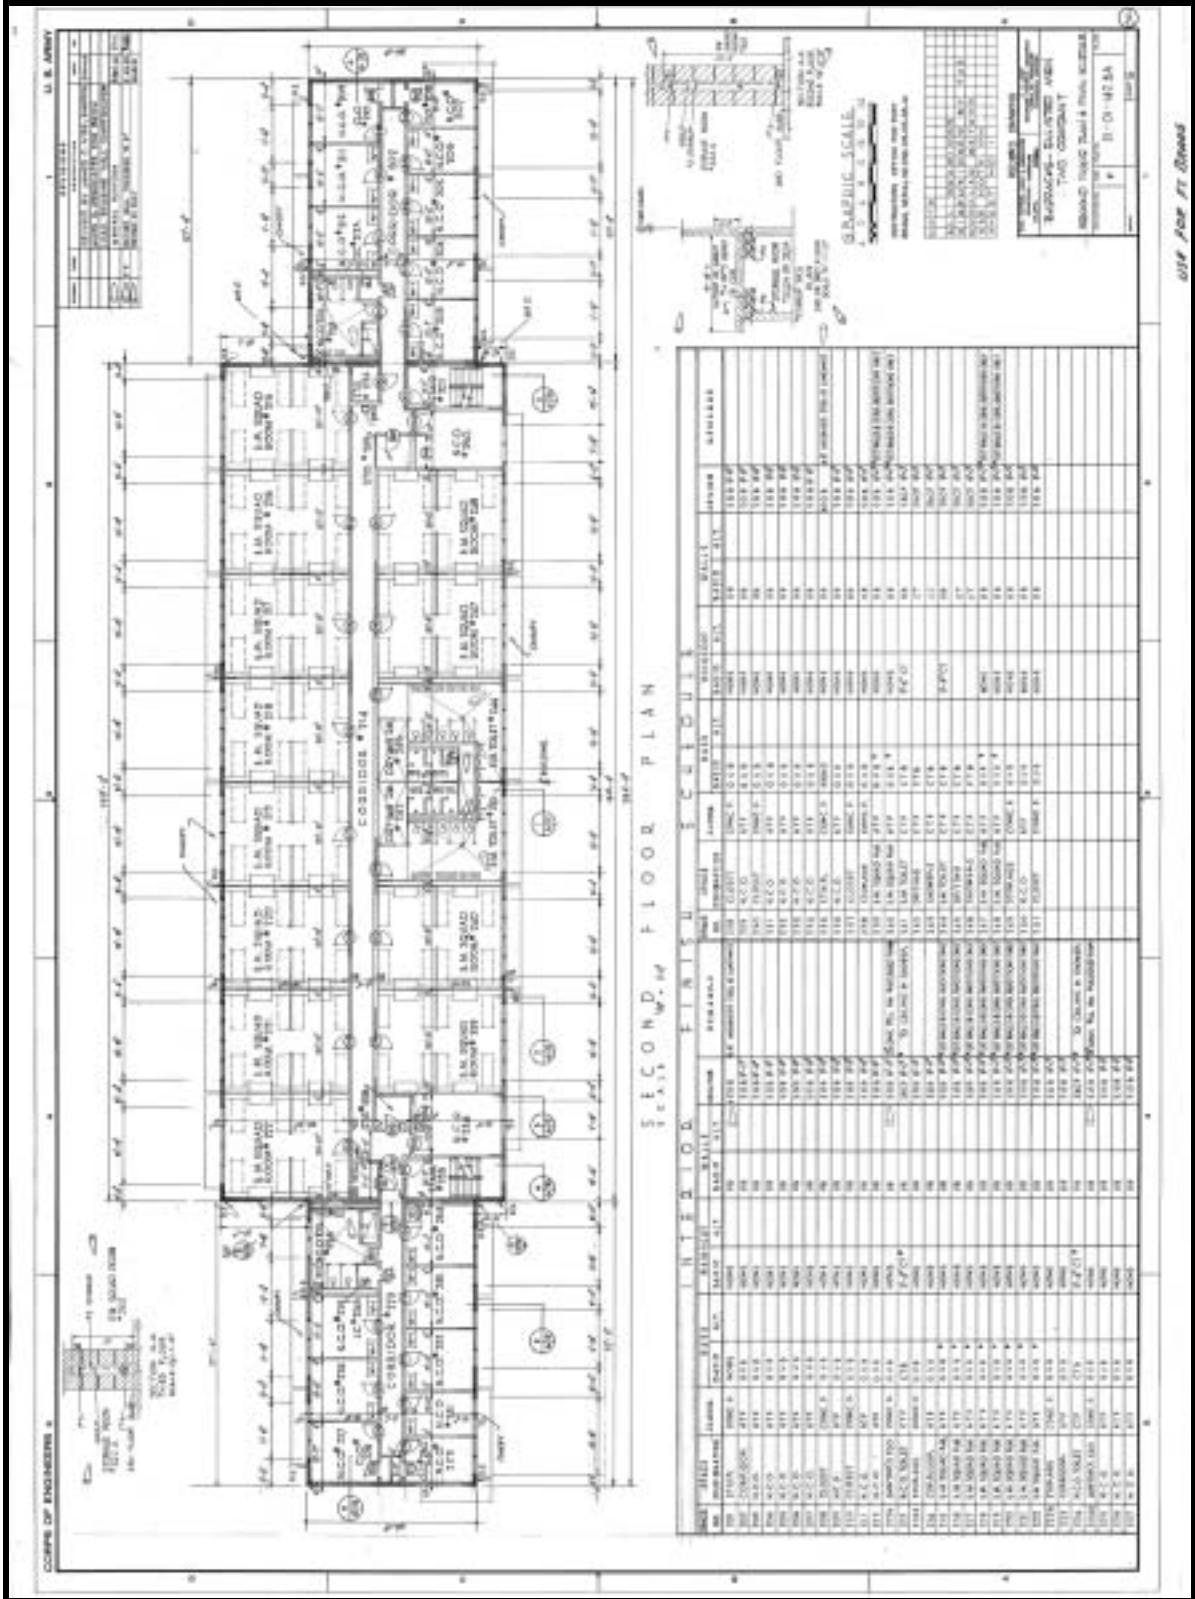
Rolling Pin, two-company barracks, second floor plan, Ft. Bragg (ca. 1959, revised 1967) (Engineering, Ft. Bragg).
